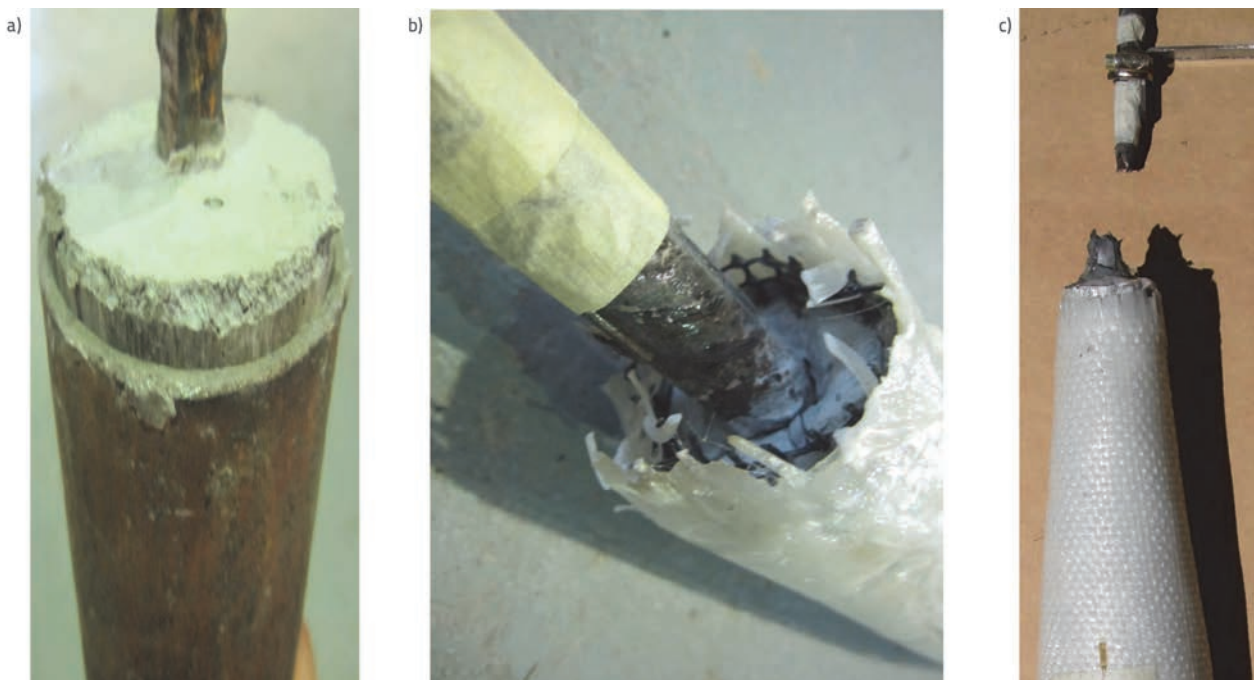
Failure modes of specimens: a) Grout-sleeve interface failure; b) Bar pull-out failure; c) Bar tensile failure
